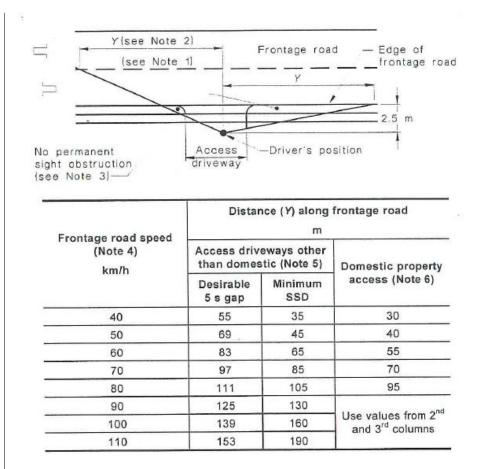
SIGHT DISTANCE REQUIREMENTS AT ACCESS DRIVEWAYS
